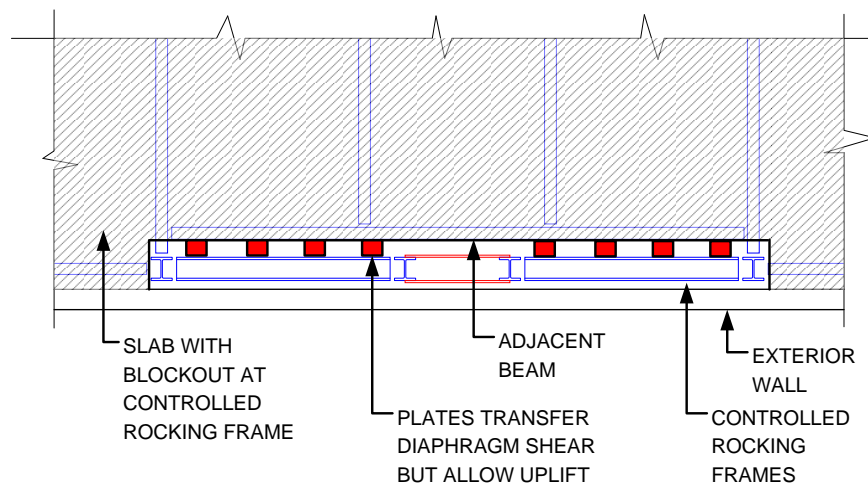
Plan View of a Possible Diaphragm to a Dual Frame Rocking System Connection that Reduces Damage
